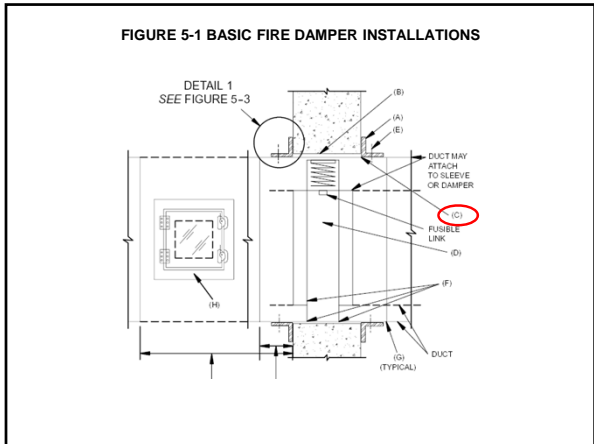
BASIC FIRE DAMPER INSTALLATIONS
